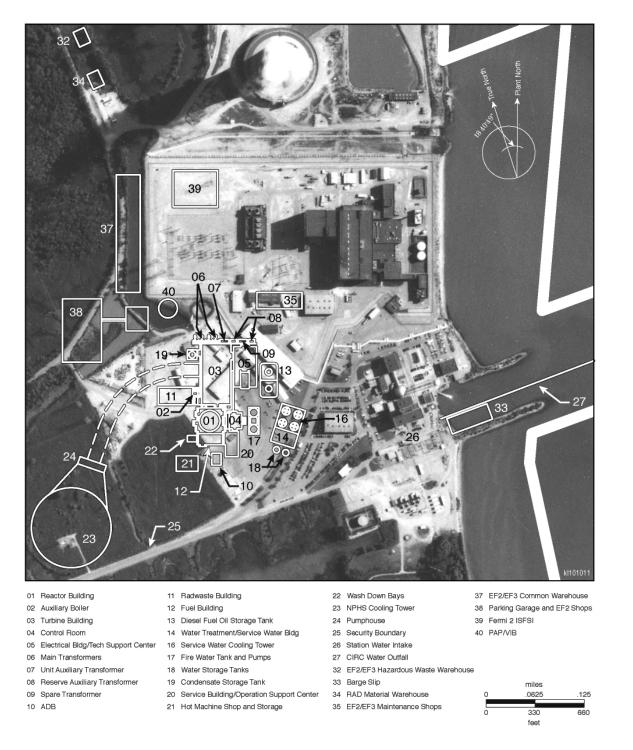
Fermi Site Layout Showing Existing and Proposed Facilities: Power Block and Adjacent Facilities (Detroit Edison 2011b)
